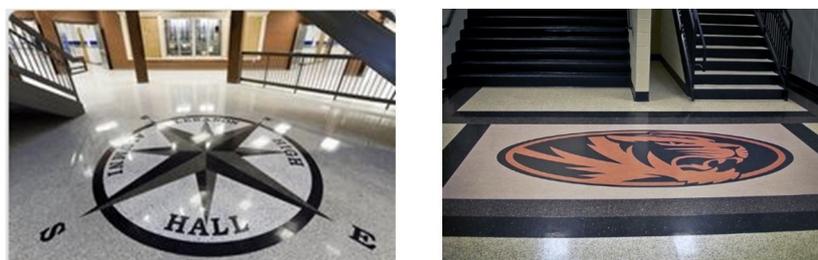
Examples of granite floor finishes in common areas – stairs and corridors
